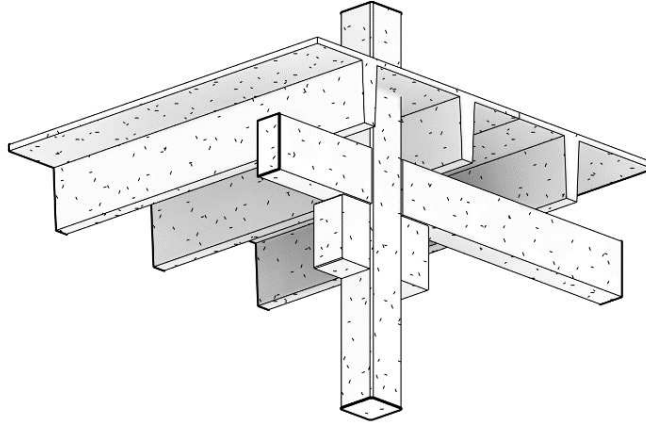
Exposed double-T sections and overlapping beams are indicative of precast frames
